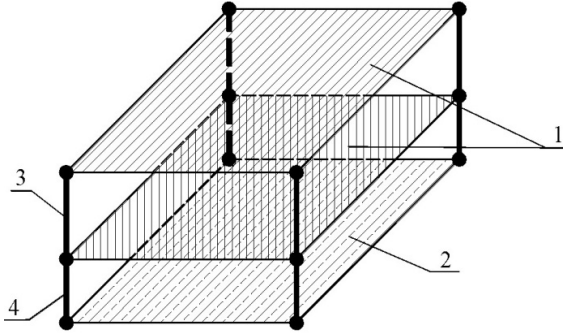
Finite element model of two-layer rigid pavement: 1 – shell finite element that models upper and lower concrete slabs; 2 – shell finite element on a Winkler foundation that models stabilized base; 3 – finite element FE 262 that models the separator layer between upper and lower concrete slab; 4 – finite element FE 262 that models the separator layer between lower concrete slab and stabilized base
